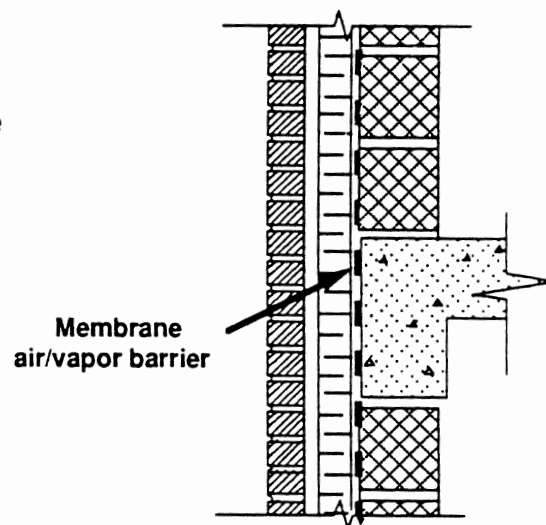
Masonry Wall Air Barrier (Perreault 1989)
